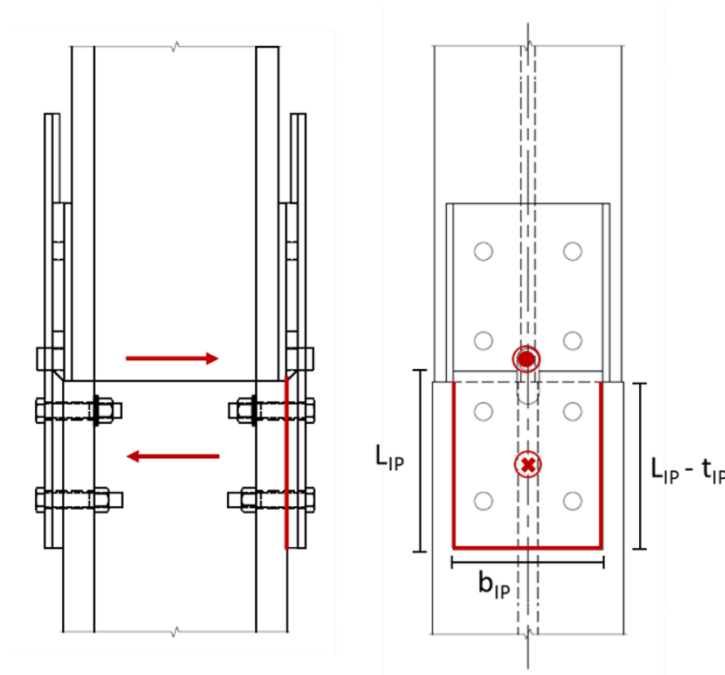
Dimensions and layout of IP welds affixed to the Lower Column to prevent strong axis shear.
